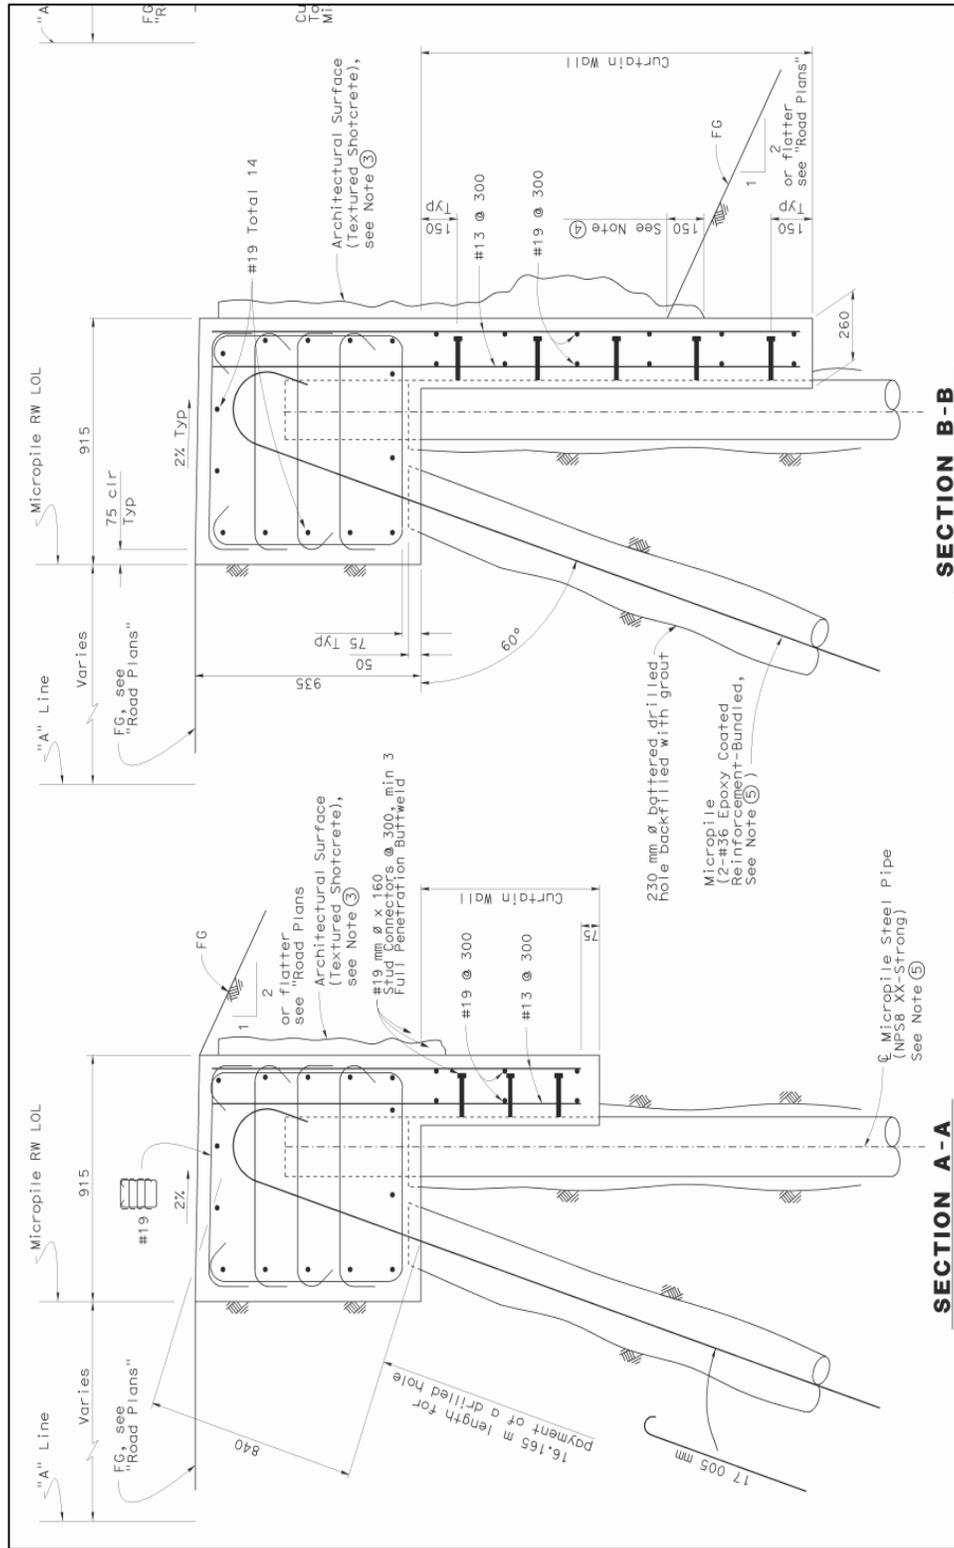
Duncan's Mills Retaining Wall – Typical Cap Beam-Curtain Wall Cross Sections
